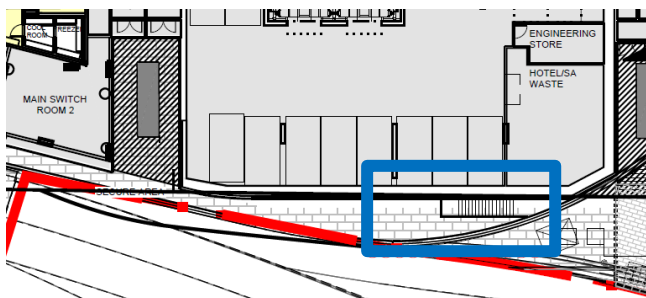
New Ausgrid staircase near southern site boundary (blue rectangle)
